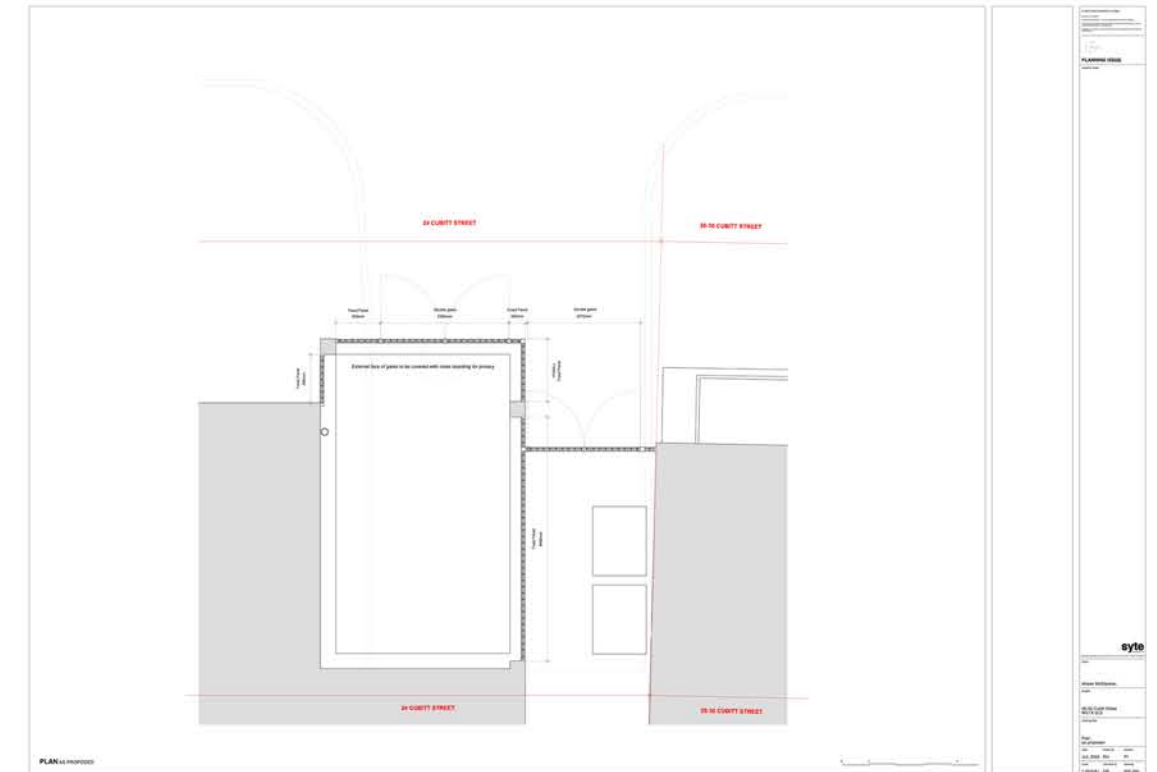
Floor Plan as proposed showing the extent of the enclosure
